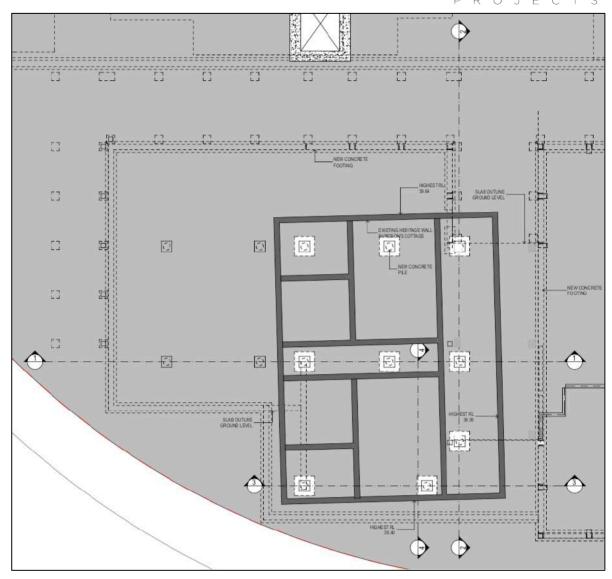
Approximate location of Surgeon's Cottage archaeological footings over lower ground plan of future Building J. Proposed locations of concrete piles and placement in an effort to avoid footings (Source: FJMT 2019 DA-5004, 18.12.19)
